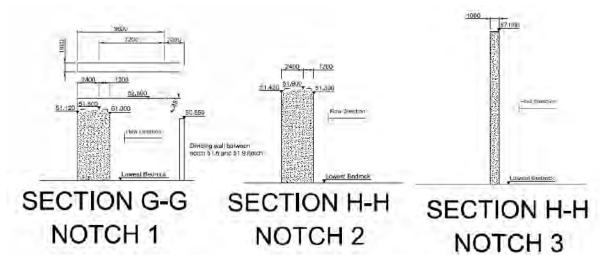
Proposed BRVAS abstraction works section G-G and H-H (Weir Cross Sections)
